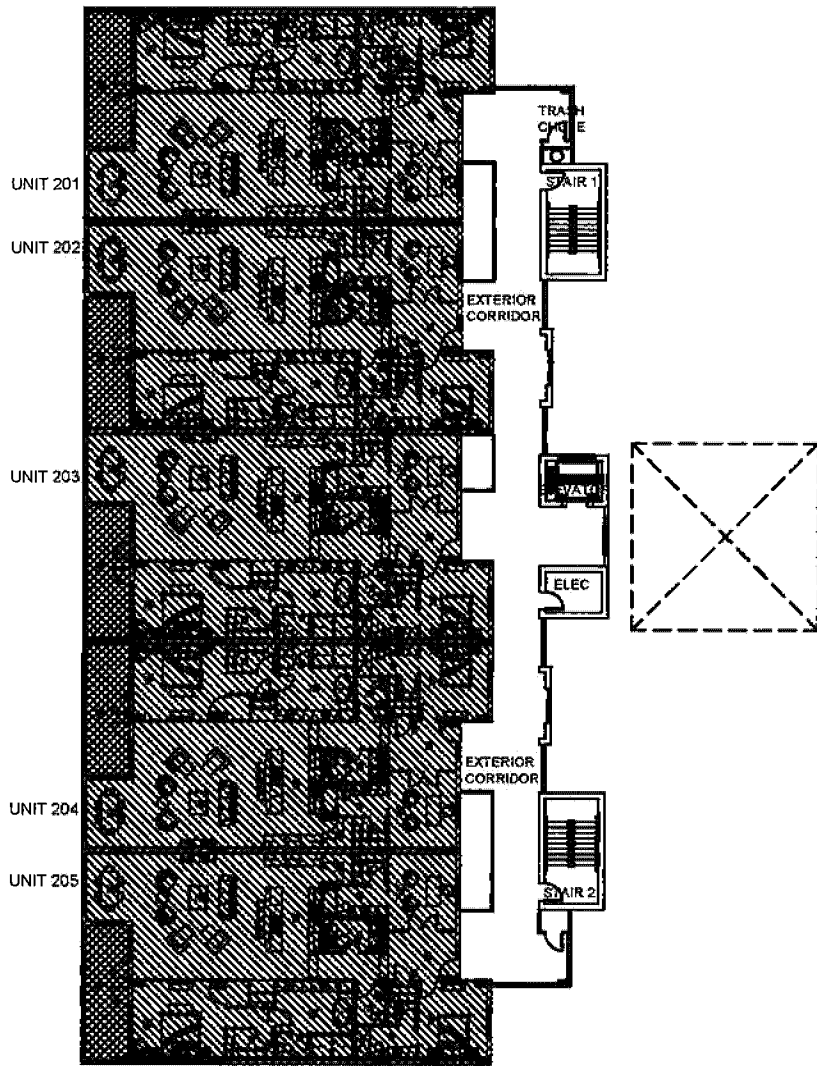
EXHIBIT "D": FLOOR PLANS & PARKING PLAN
